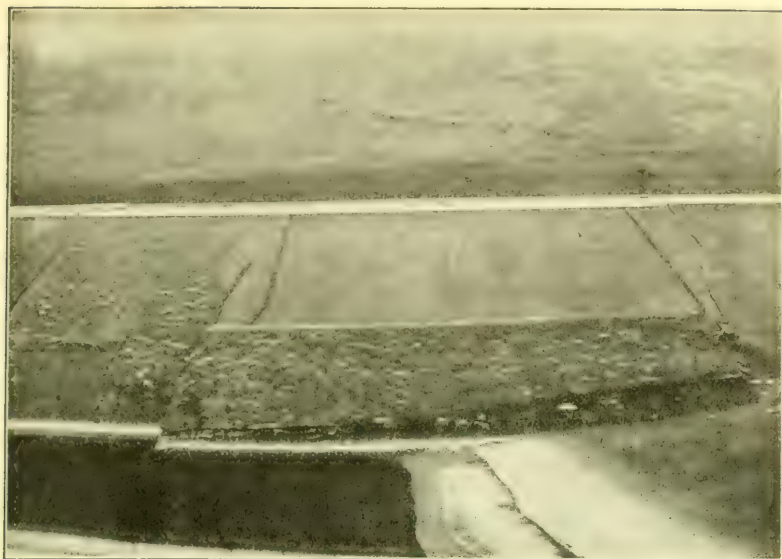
RESERVOIR NO. 3: HORIZONTAL CRACKS IN BUTTRESS, AND BREAKS IN WEST SLOPE AND PARAPET, SEPTEMBER 28TH, 1897.
